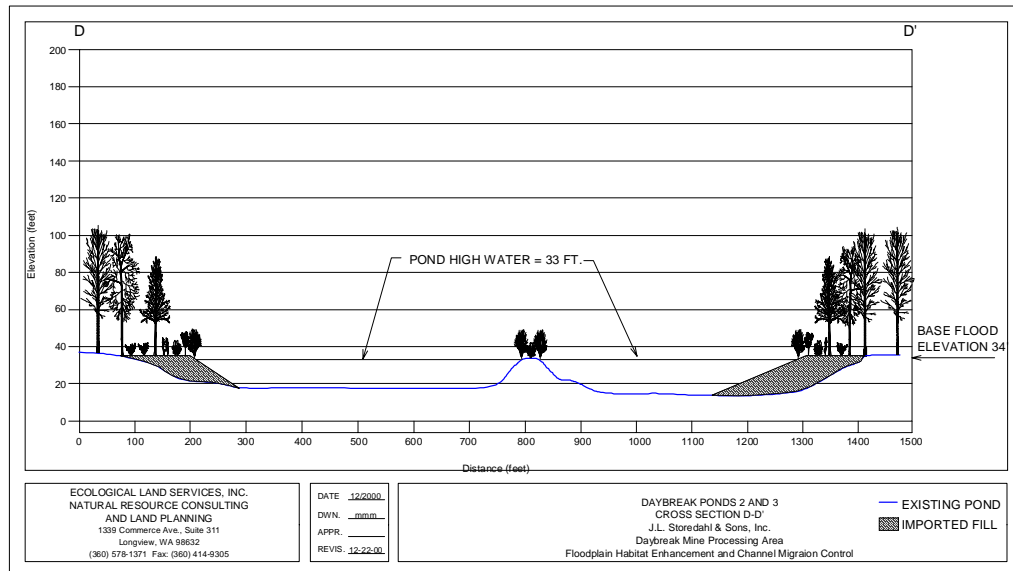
Conceptual section view of proposed fill plan for Daybreak Ponds.
